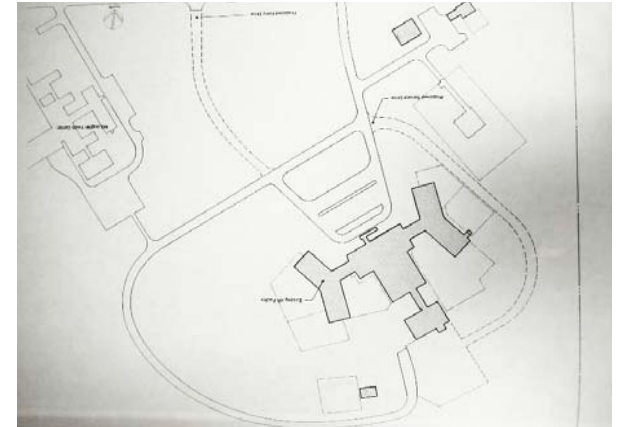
API site plan showing original building and proposed new driveways, 1986.
